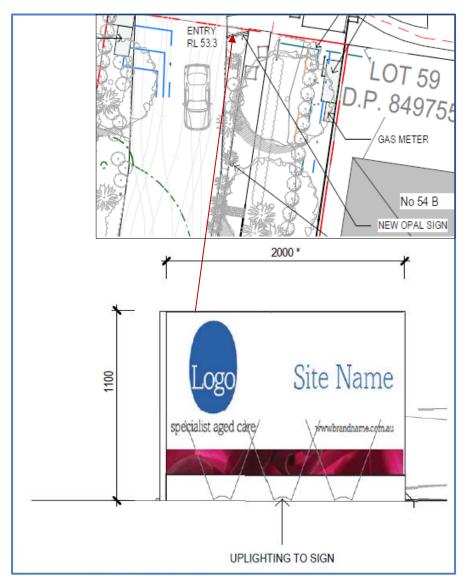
Sign 1 – Driveway Entry sign near Quarry Road frontage *Source: Jackson Teece
